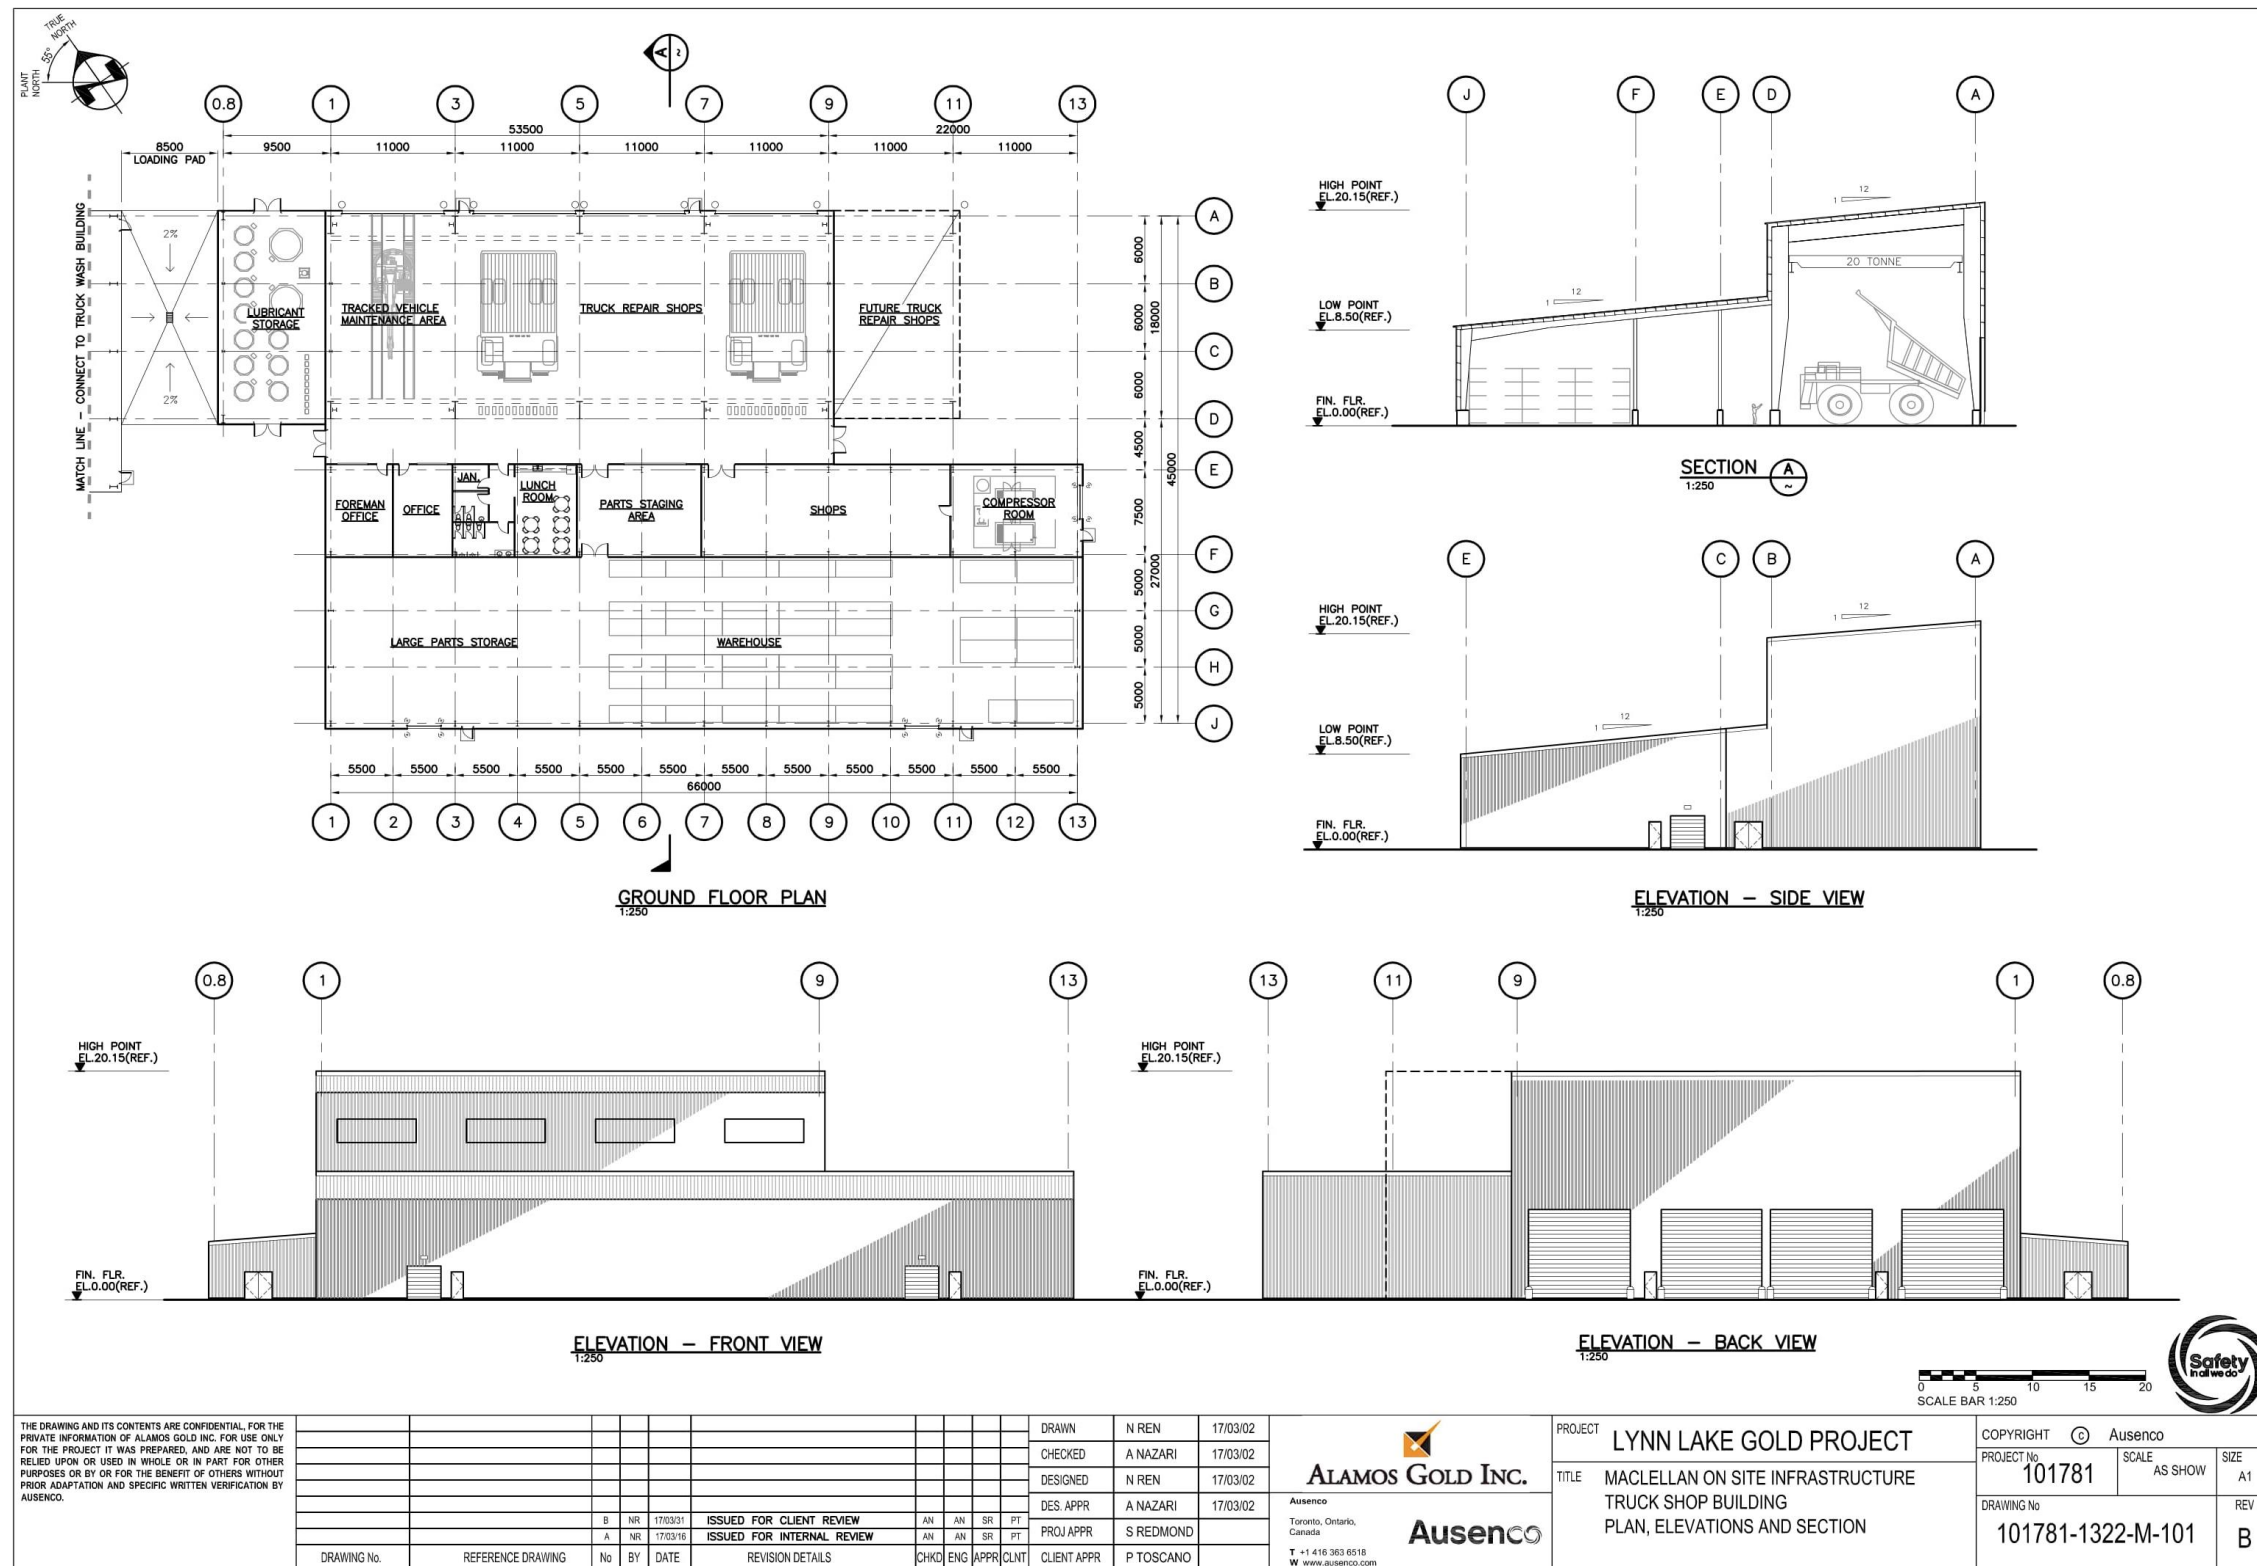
MacLellan Truck Shop/Warehouse Facility General Arrangement
